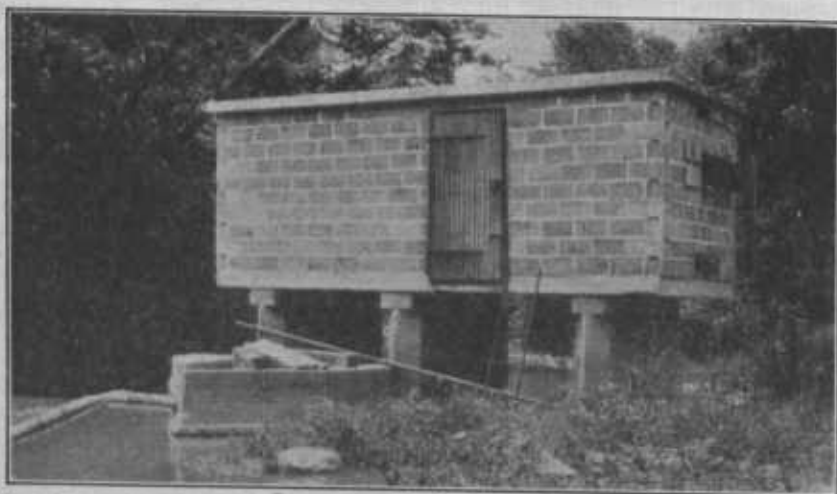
Upstream side of a substantial concrete power house 7.7 by 20 feet, 6-inch roof slab, 8-inch block walls, 8-inch floor slab, supported above high water by three piers 17 inches thick built into and buttressing a concrete dam 129 feet long. Drainage area 43.9 square miles, head 7.7 feet. Cost of 24-inch turbine \$310, 6½-kilowatt generator \$400, materials \$1,185, labor \$750, wire \$422, instruments and miscellaneous \$385, total \$3,452. Approximately one-half the cost was for the dam. Estimated cost of current per year, \$469
